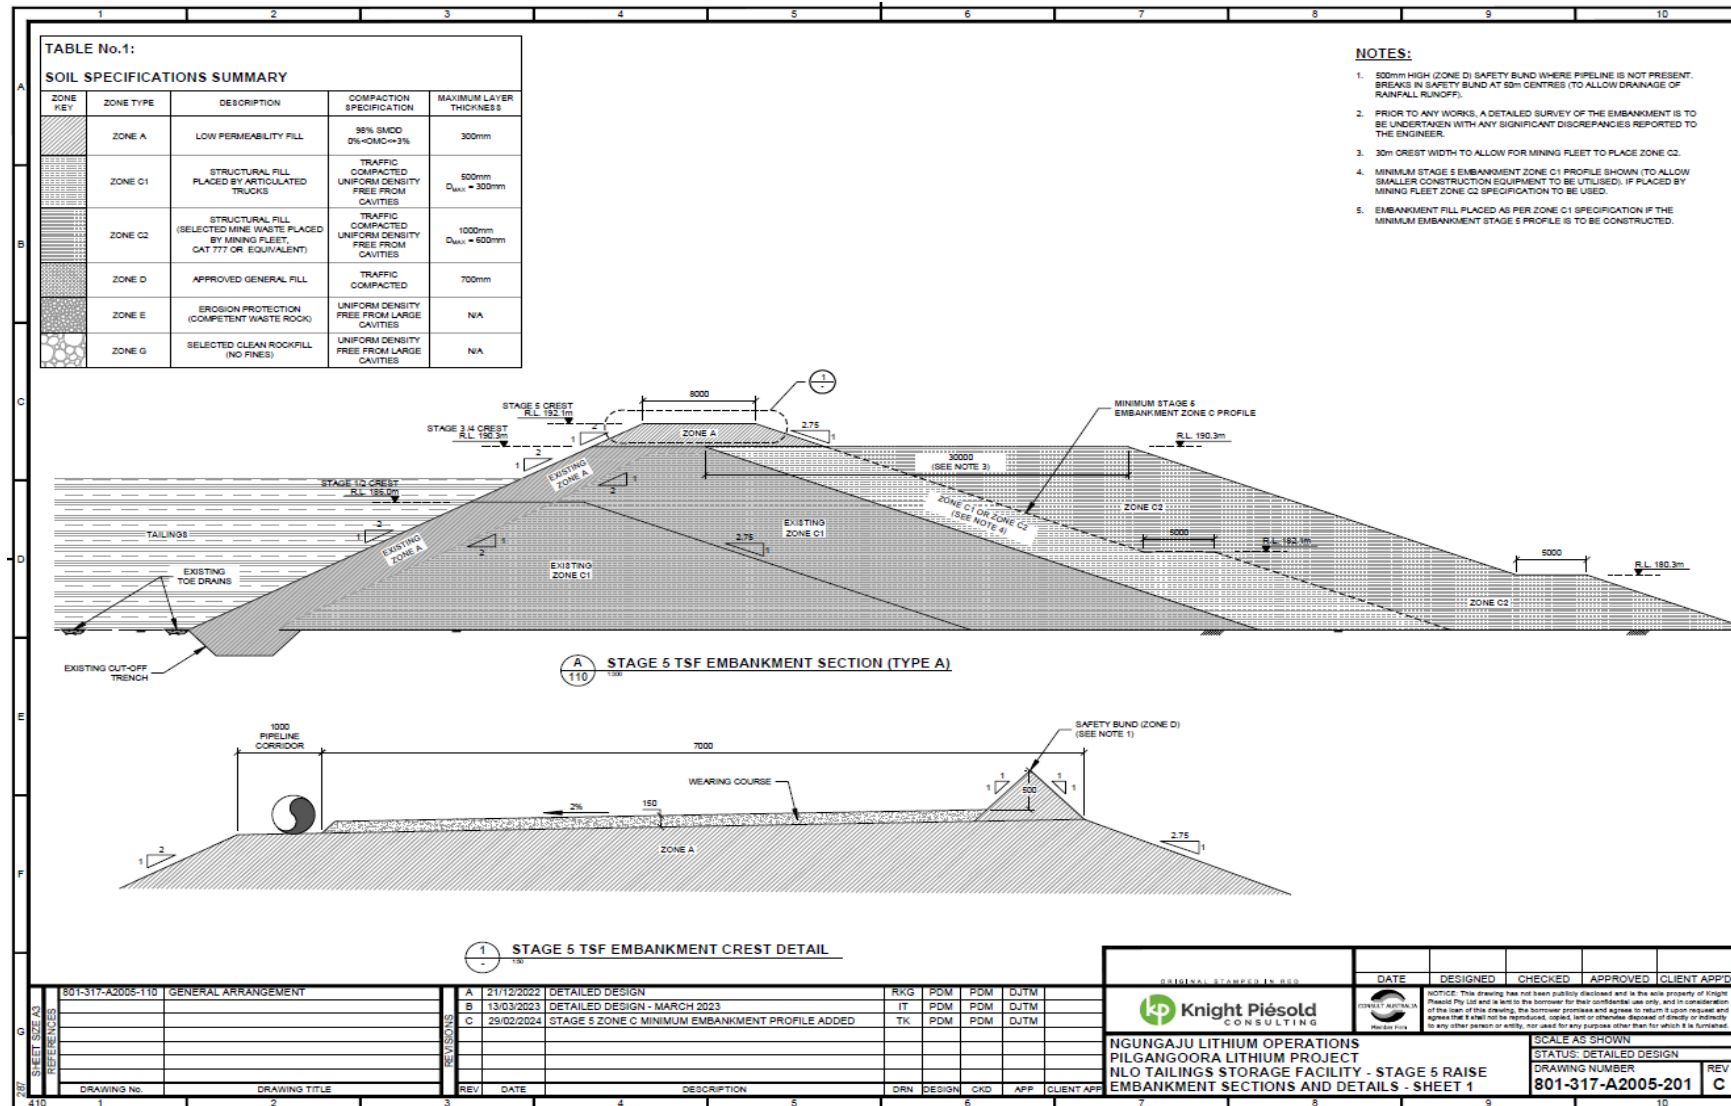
NLO TSF raise 5 embankment construction details – Type A
